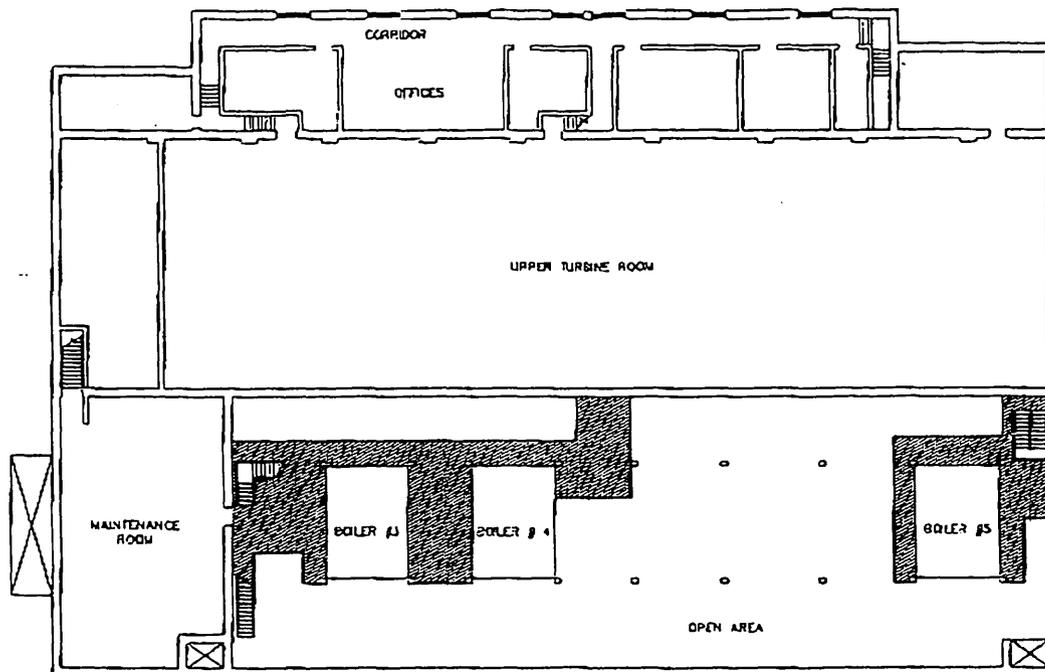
Second floor plan, Fremont Municipal Power Plant and Pumping Station.
